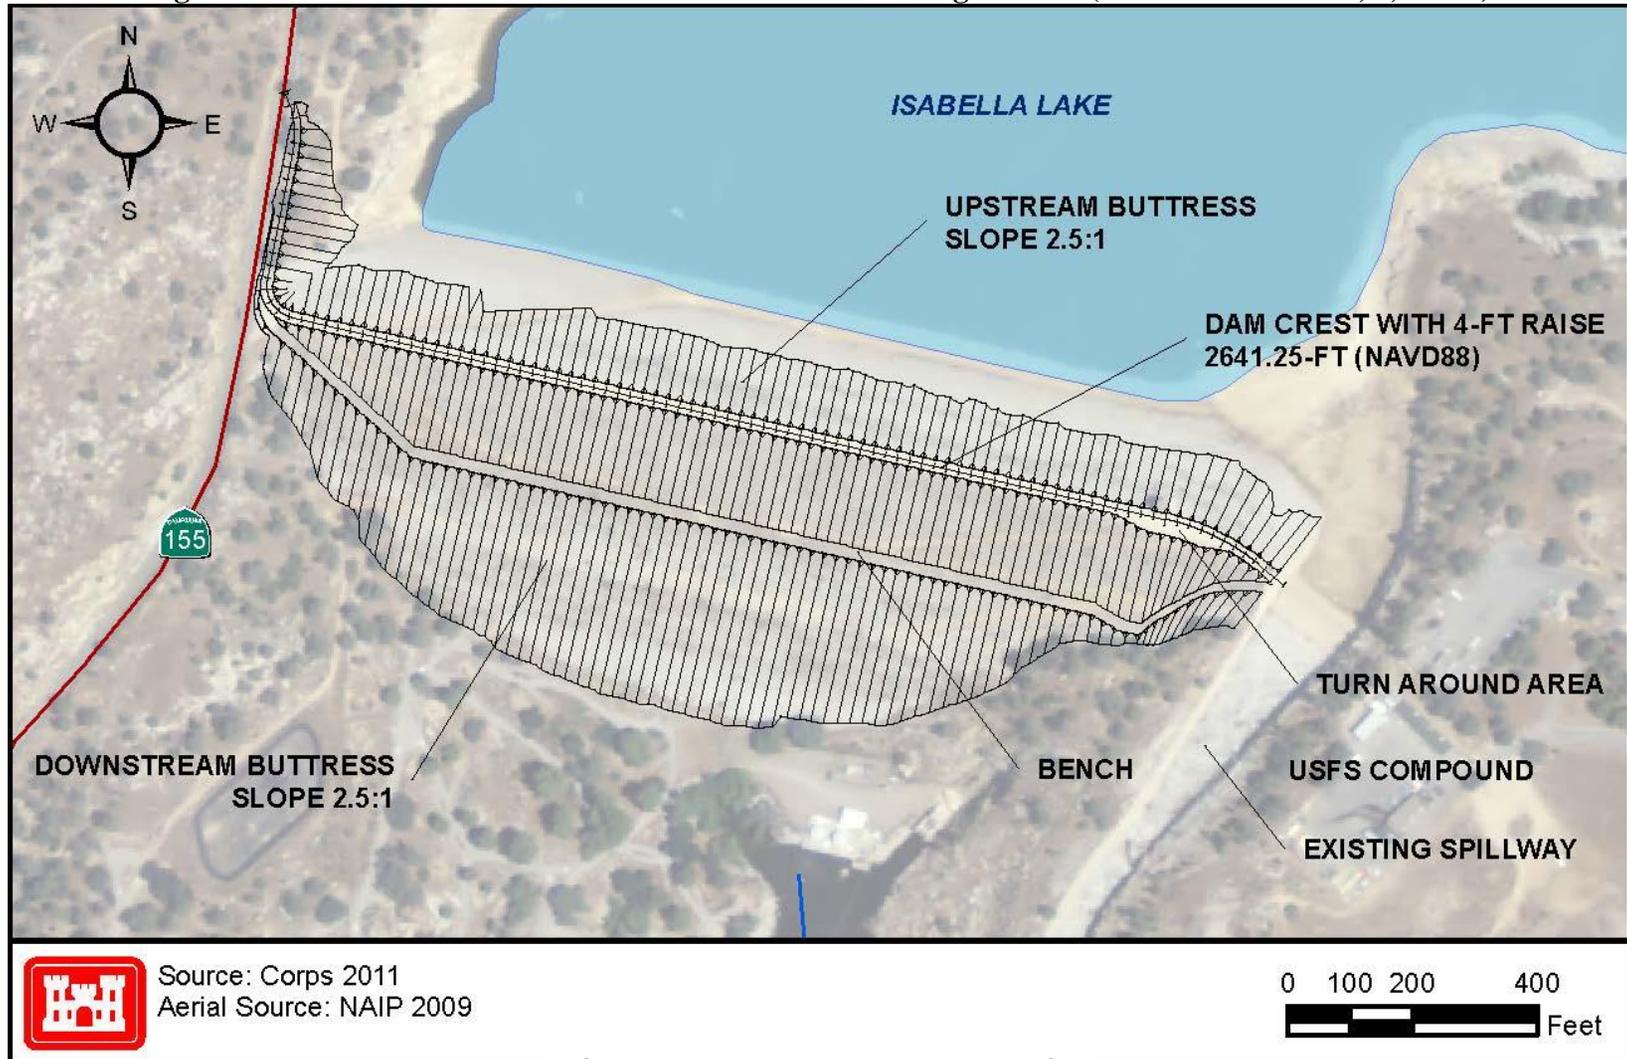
Plan View Sketch of Main Dam with Full-Height Filter (Alternative Plans 1, 2, and 3)
